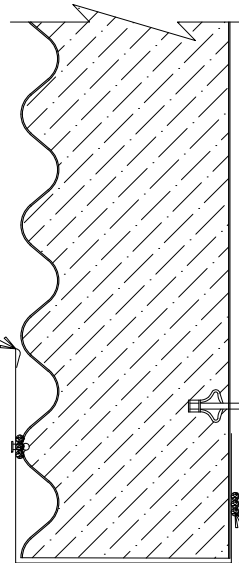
DETAIL: FRAMED OPENING - HEADER		SHEET: 1 OF 1
